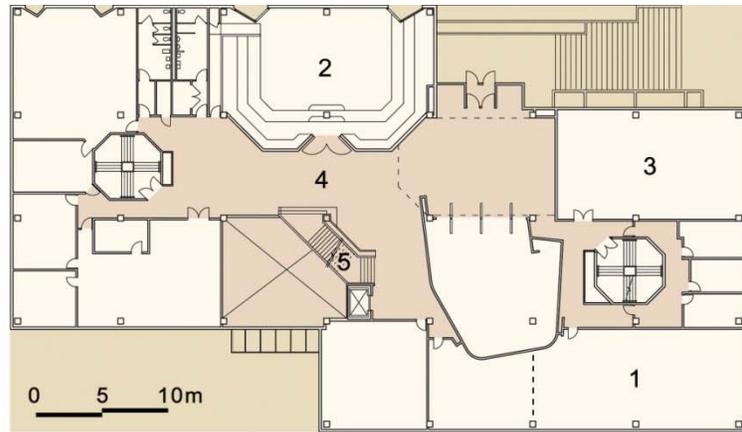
(right). Second floor plan of the Architecture Building. (1) Room ARC 200B-D: Master of Building Science (MBS) Studio. (2) Room ARC 202: Lecture room (Pit). (3) Room ARC 200 G-F: Master of Architecture (MArch) Studio. (4) Circulation area. (5) Second floor stairway.
